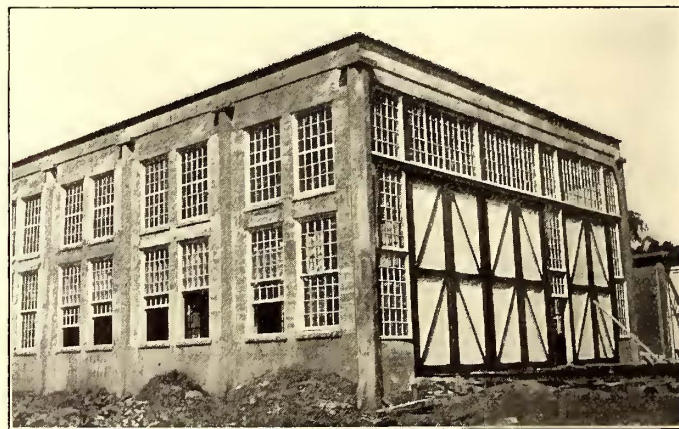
REAR END OF SHOP, SHOWING DETAILS OF FINISH
